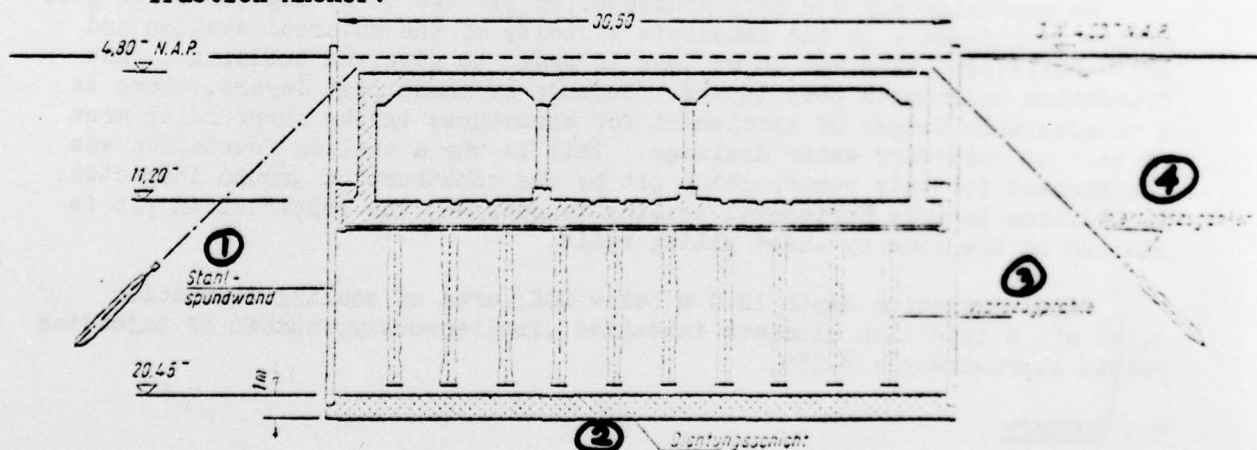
Cross Section, Construction Pit and Schiphol Tunnel, Phase II.
